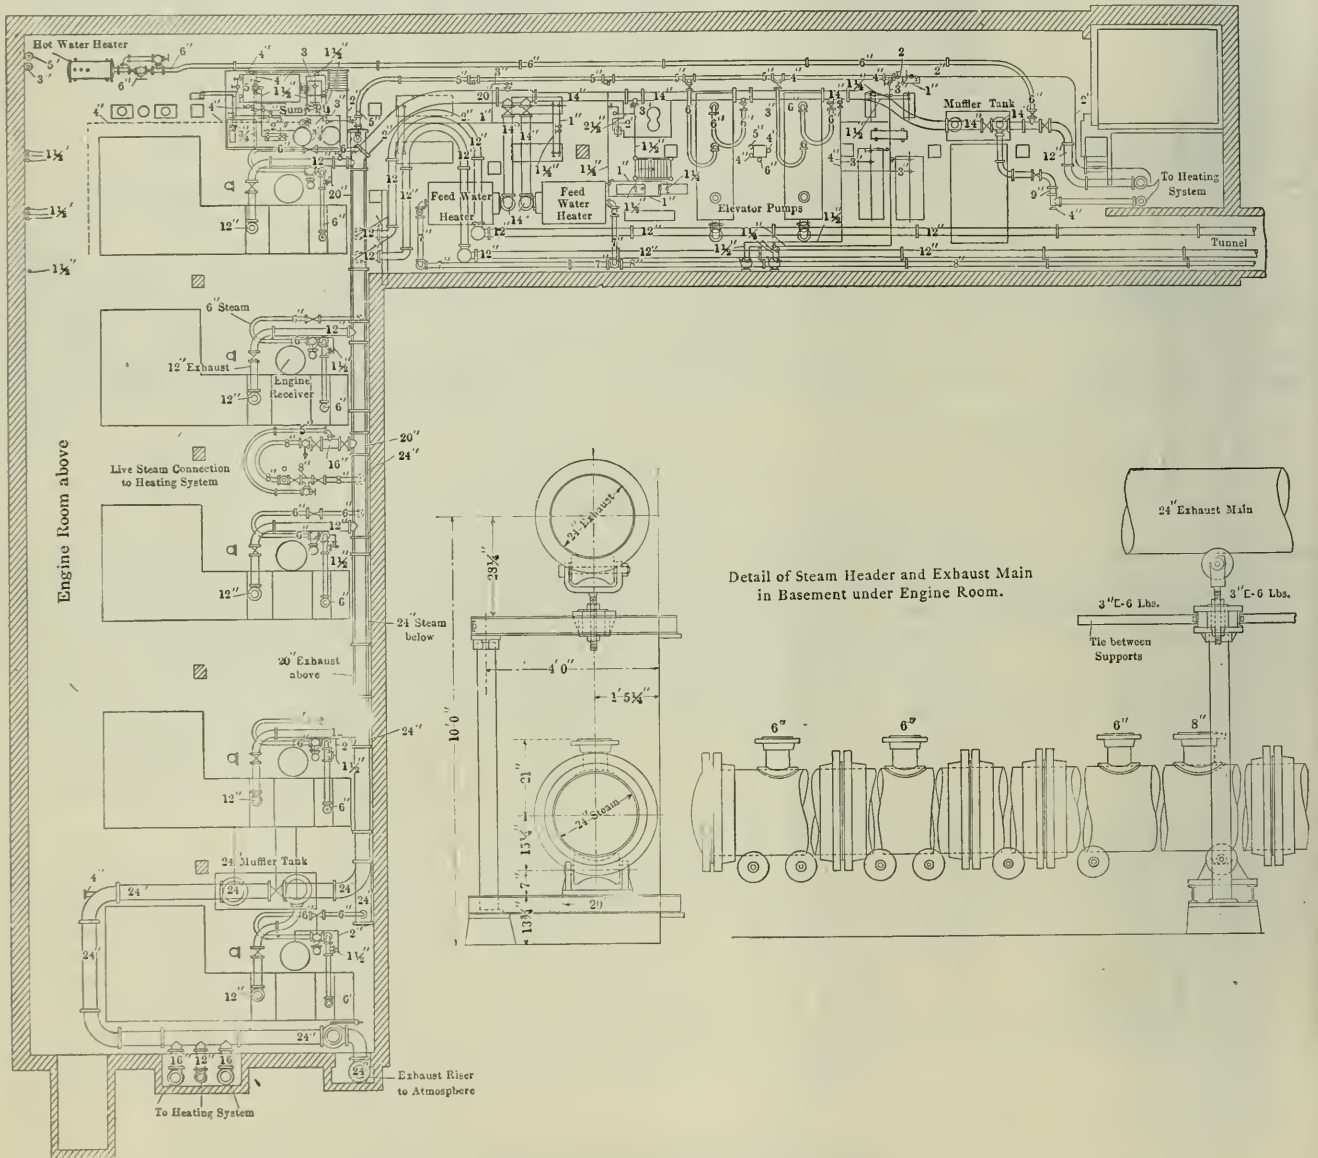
PLAN OF PIPE CELLAR AND ELL EXTENSION AND STEAM AND EXHAUST HEADER DETAIL
